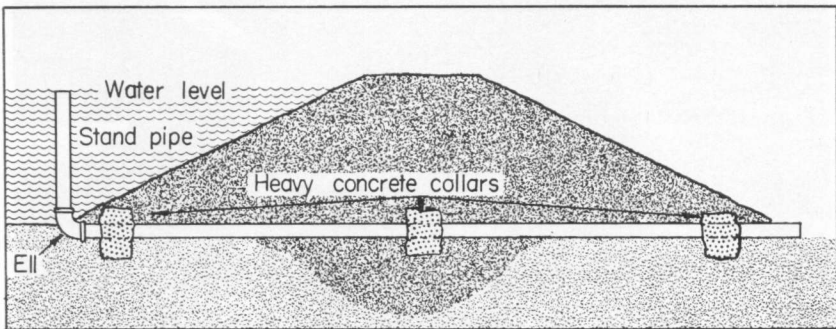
Cross sectional diagram of a dam showing filled core trench, the drain pipe with concrete collars to prevent seepage, and a threaded standpipe for draining the pond.
